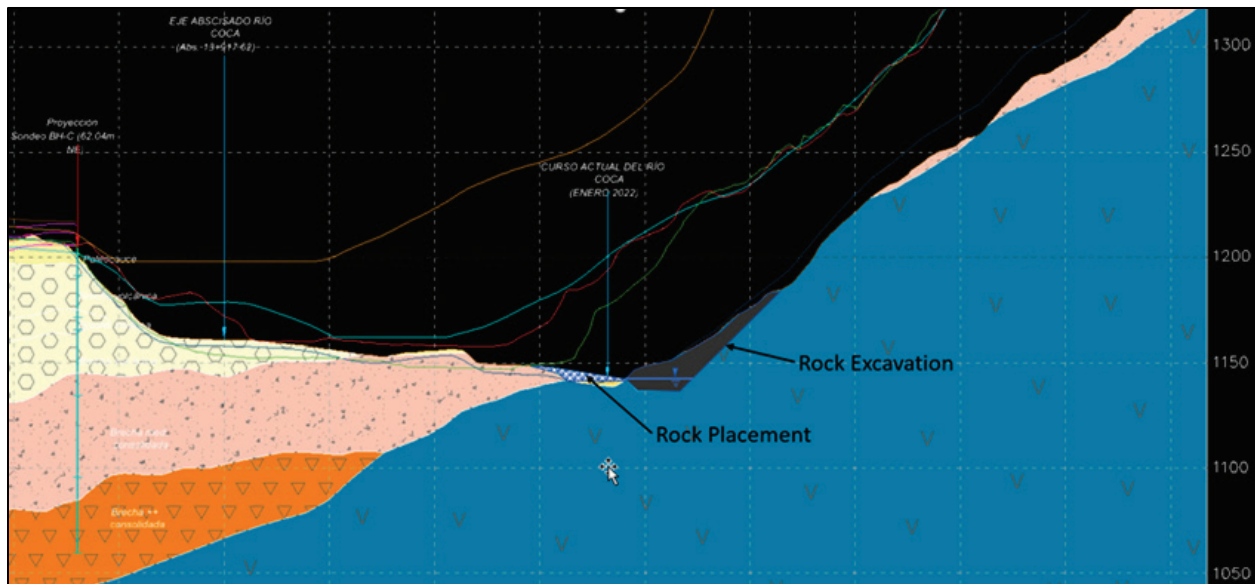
Rock excavation and placement to prevent further downcutting; example is at Km 14. Image adapted from CELEC (2021).
